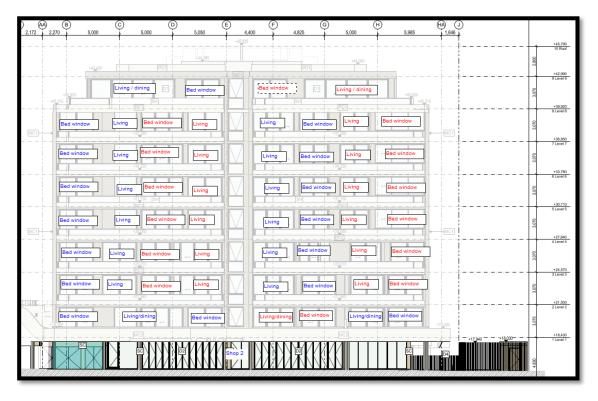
Western elevation of 49 Gerrale Street showing window locations
